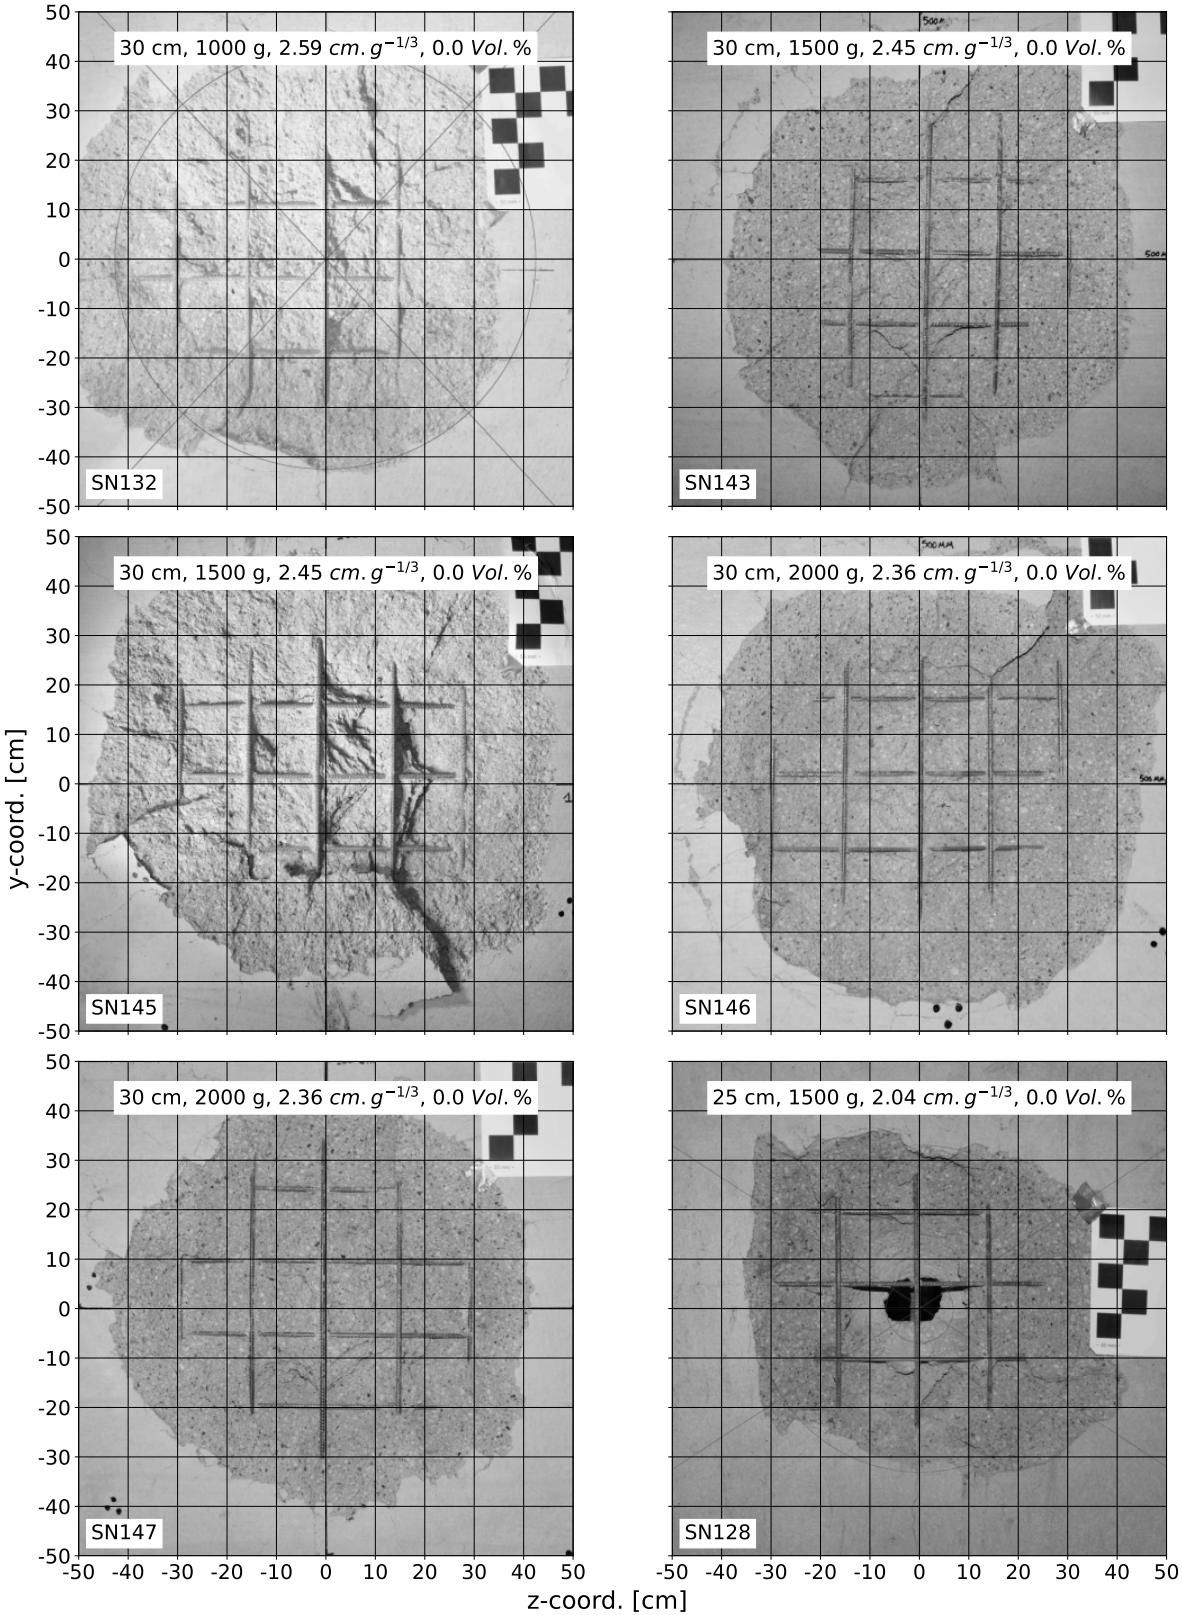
Spalling crater (without steel fibers, part 2)
